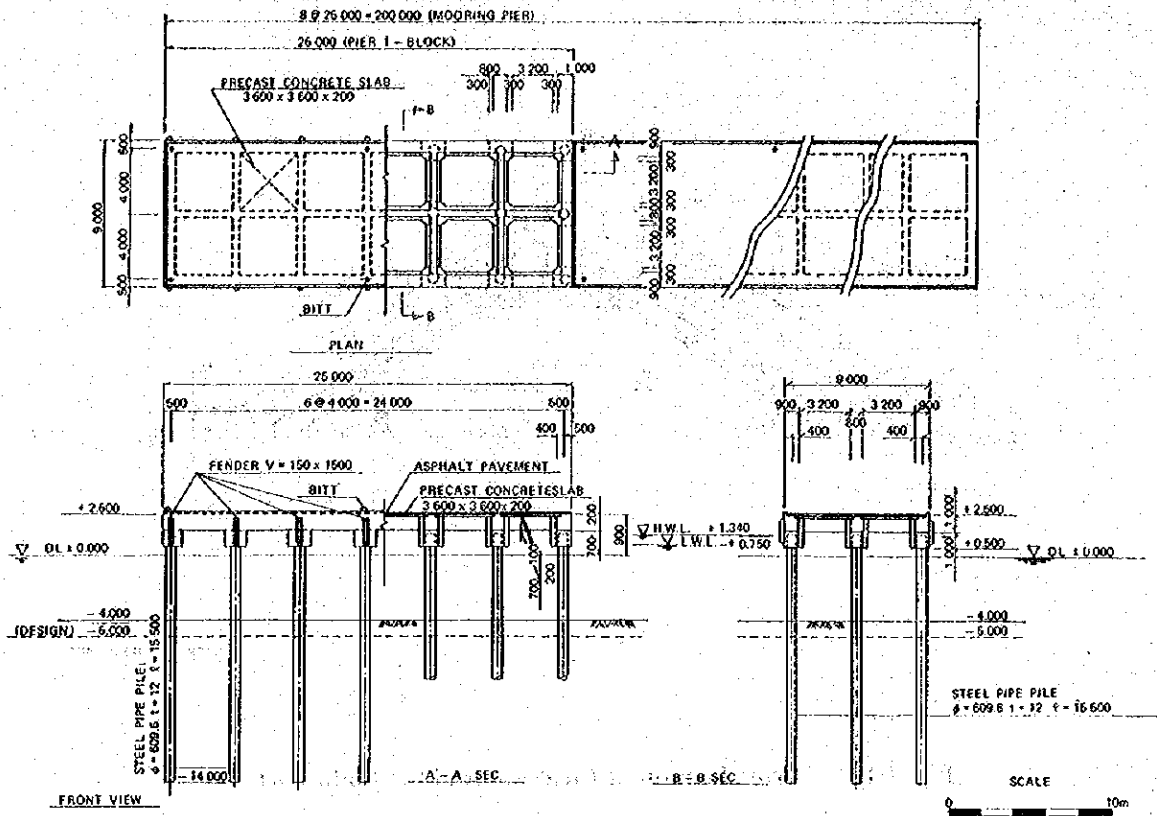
Cross Section of Mooring Pier -- Iloilo Port
